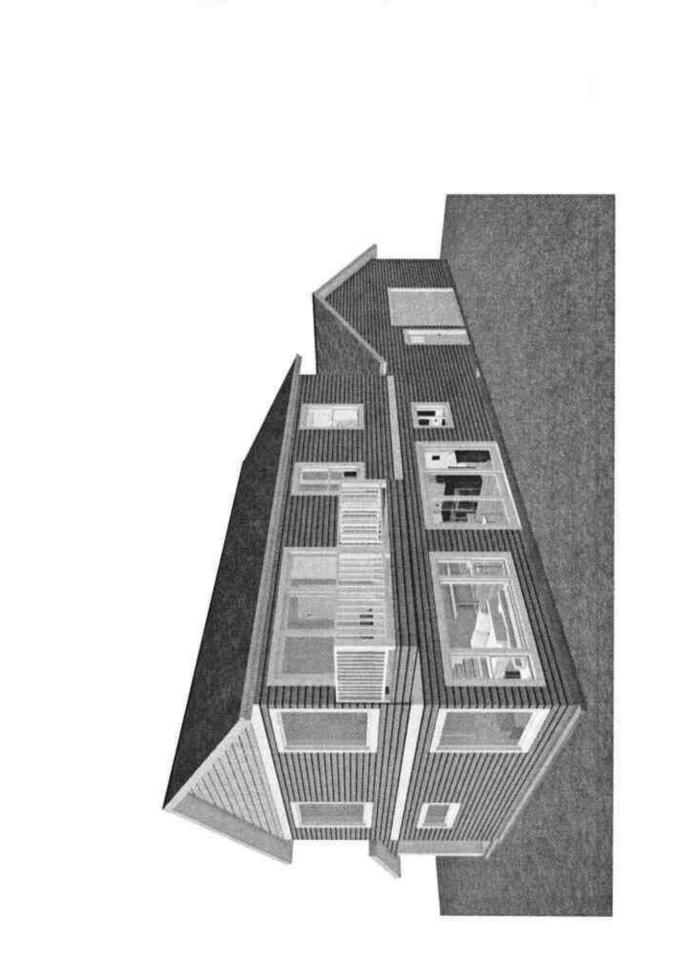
Exhibit C (Continued) (for ZBA 21-0002) Construction plans from approved ZBA for house ZBA 19-0017
